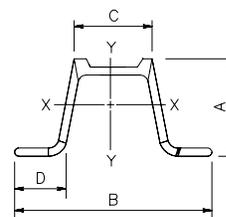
DETAIL OF BRACKET FOR SIDE MOUNTED SIGNS
